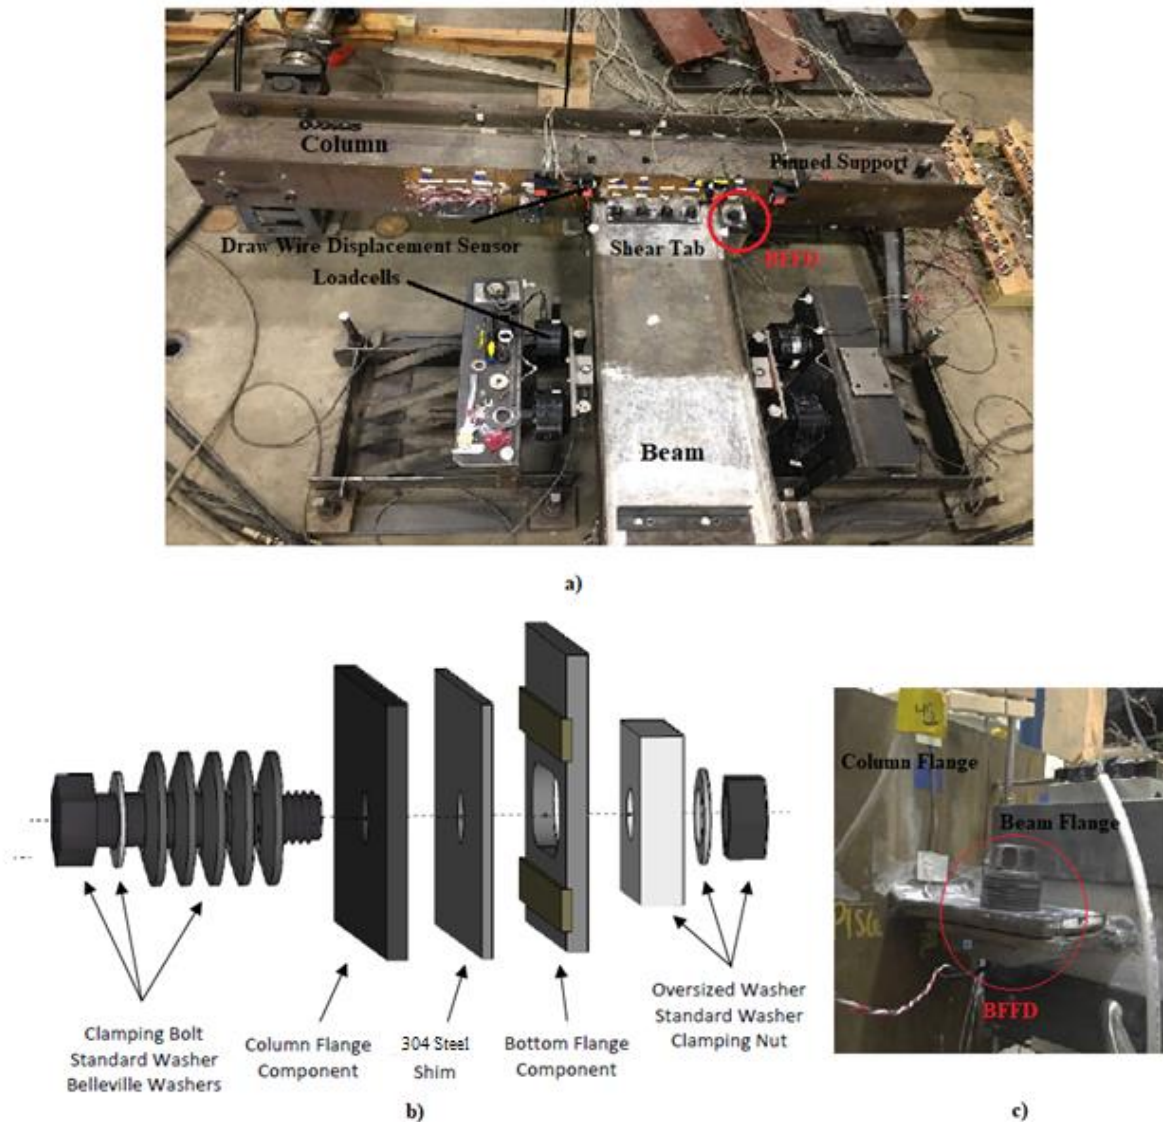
a) Photo of Simple Shear Tab Connection with BFFD, b) BFFD 3D Rendering, c) Photo of Installed BFFD
